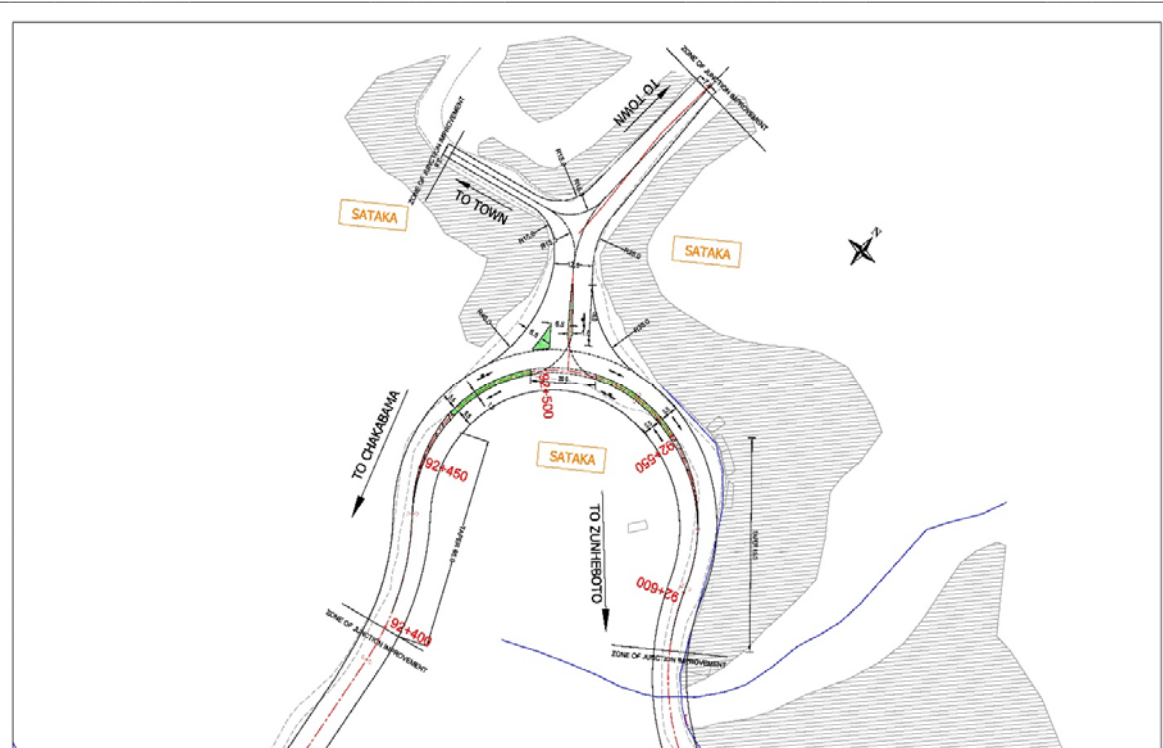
Junction Improvement at km 92+510 on C Z Road
